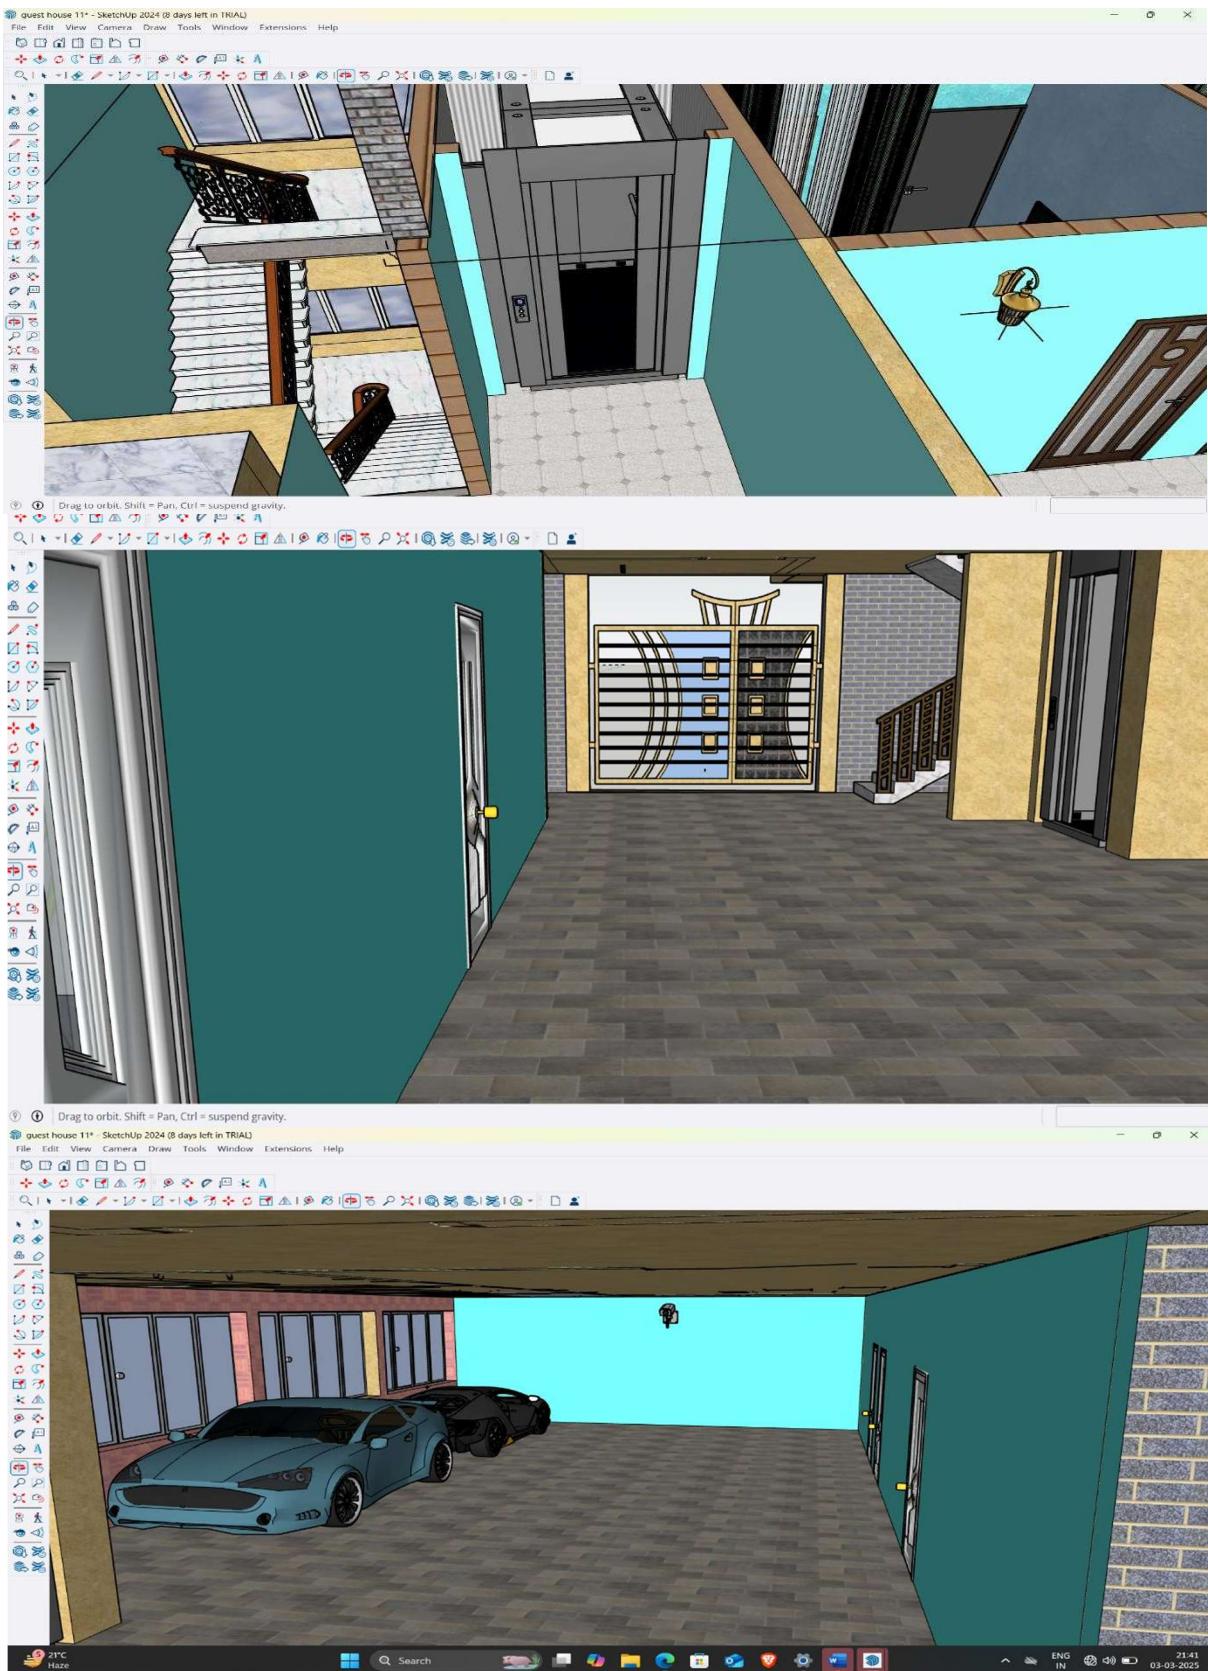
(e), 3.(f) Stair, Lift, and Parking
